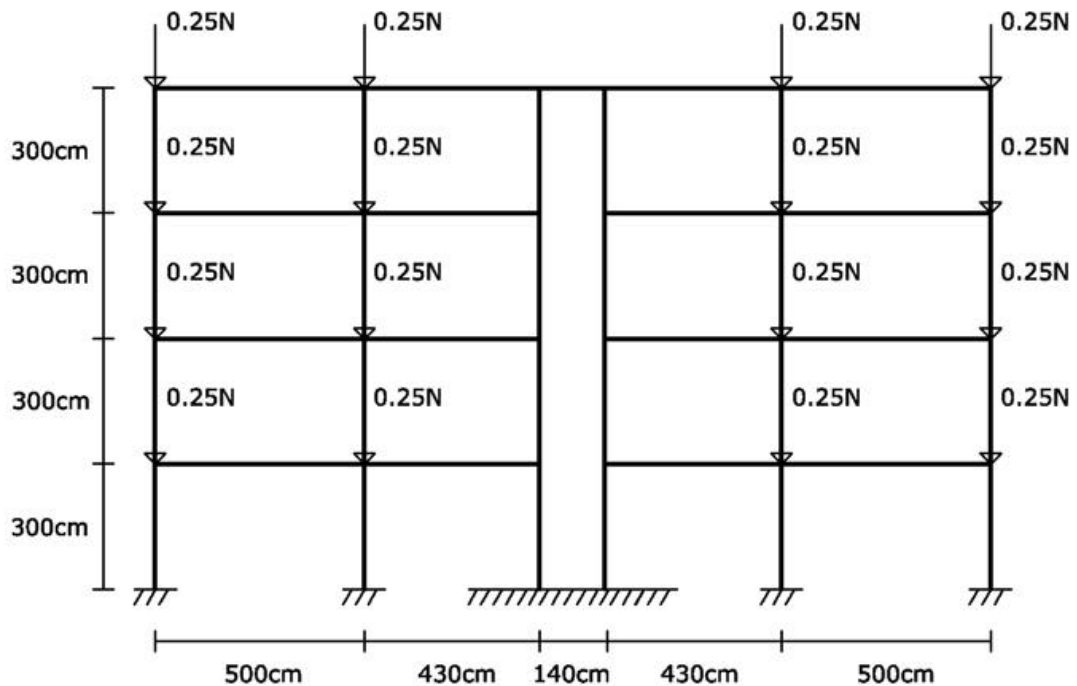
Geometry of the Structural Frame with Shear Wall (L=140cm)
